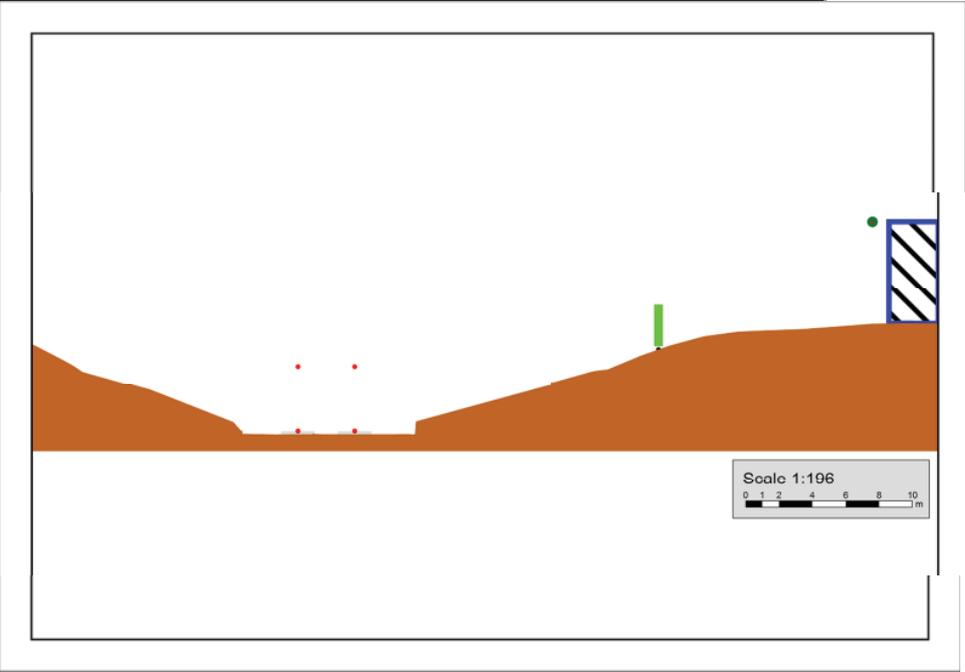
Cross Section at PI 17, 396 Woodstock Road
